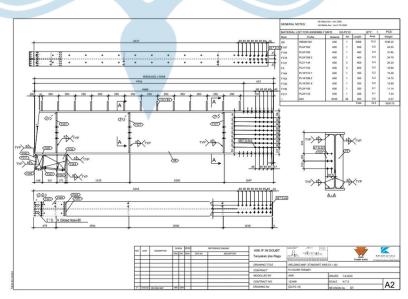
Sorowako Bridge Fabrication Shop Drawing (Source: PT. Krakatau Baja Konstruksi, 2023)
